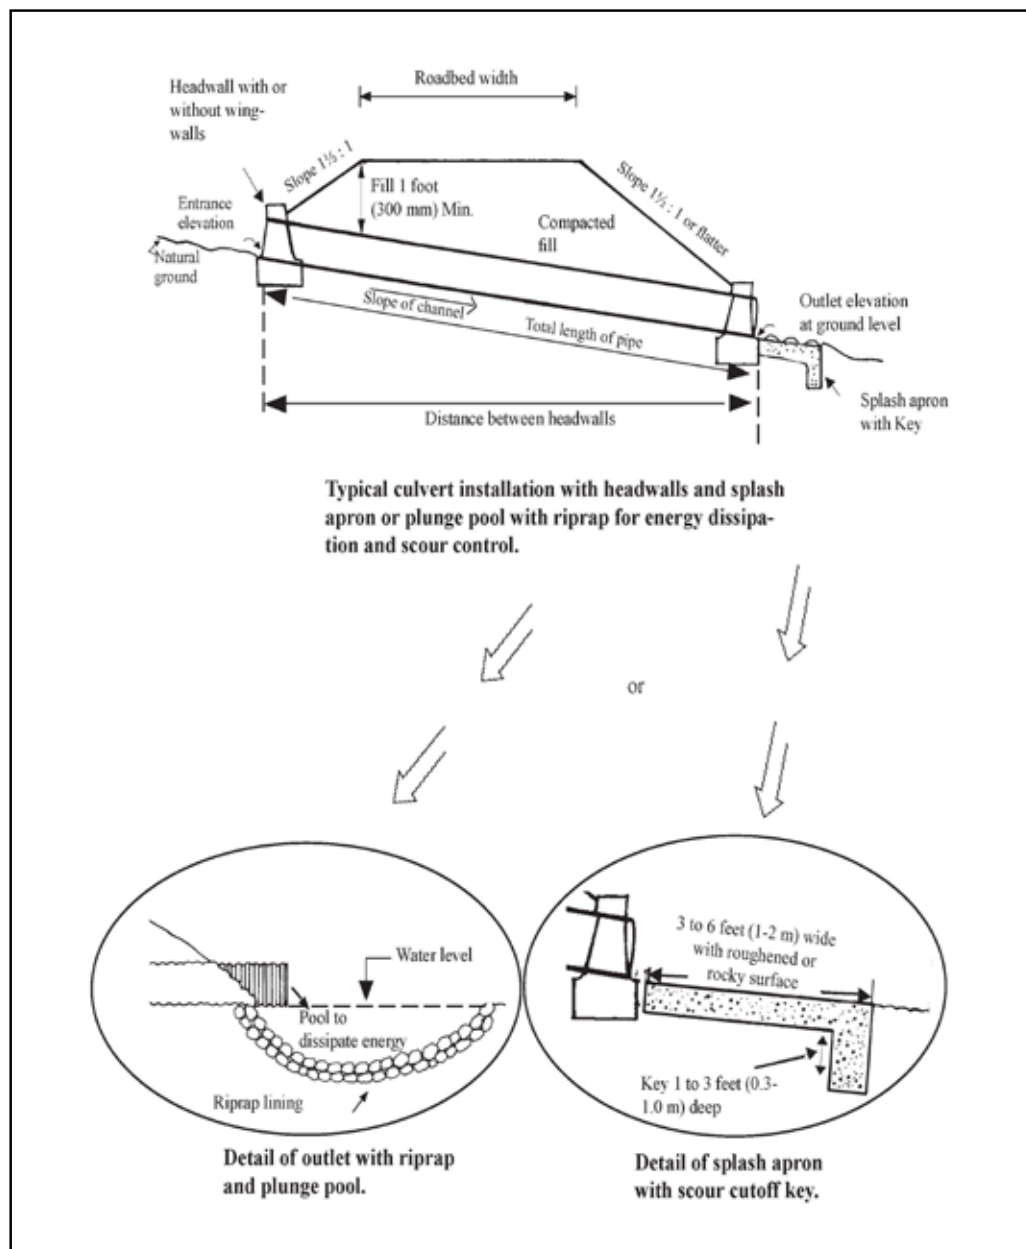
Outlet protection options to prevent scour at the pipe outlet.
